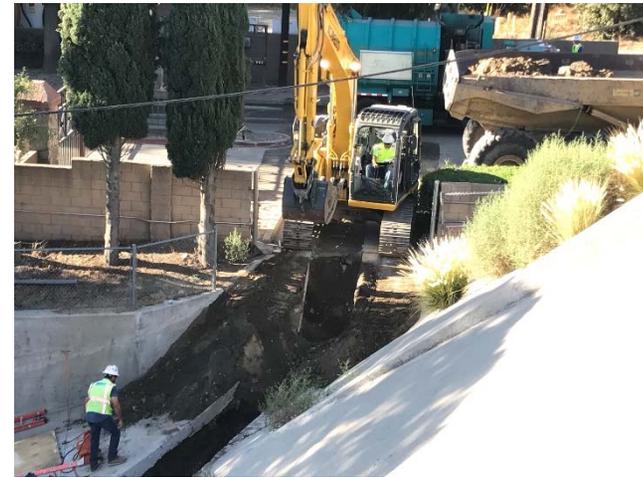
Terminal Basin Outlet Roadway Cattleguard
